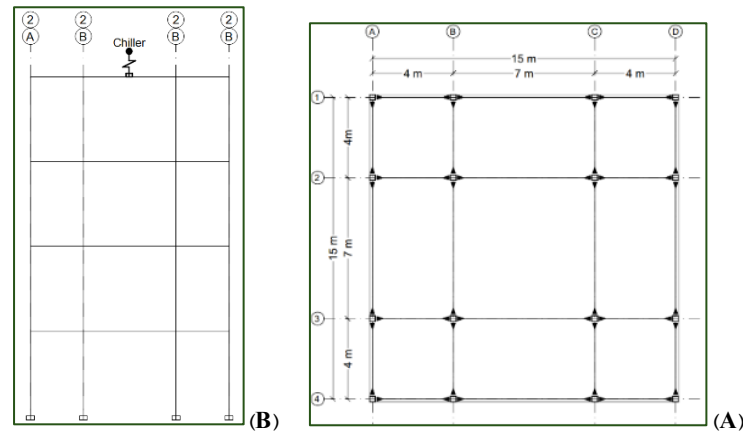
a) Plan view of the studied structures, b) Two-dimensional frame of the short-column structure with modeling of the non-structural component on the roof level as a single-degree-of-freedom system
